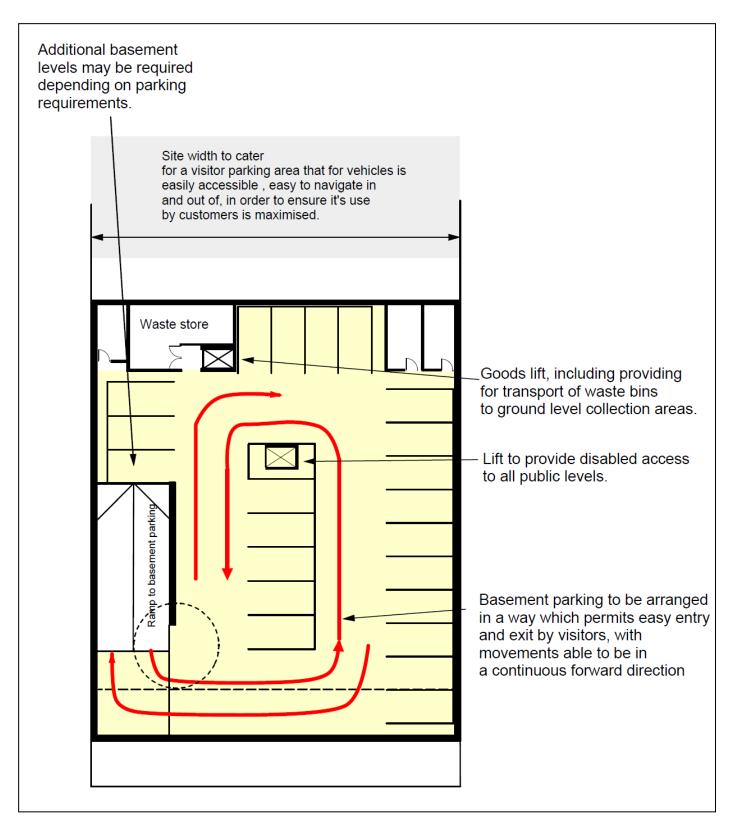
Site Access and Parking Location Principles diagram for consideration of site width and commercial development showing basement floor plan.
